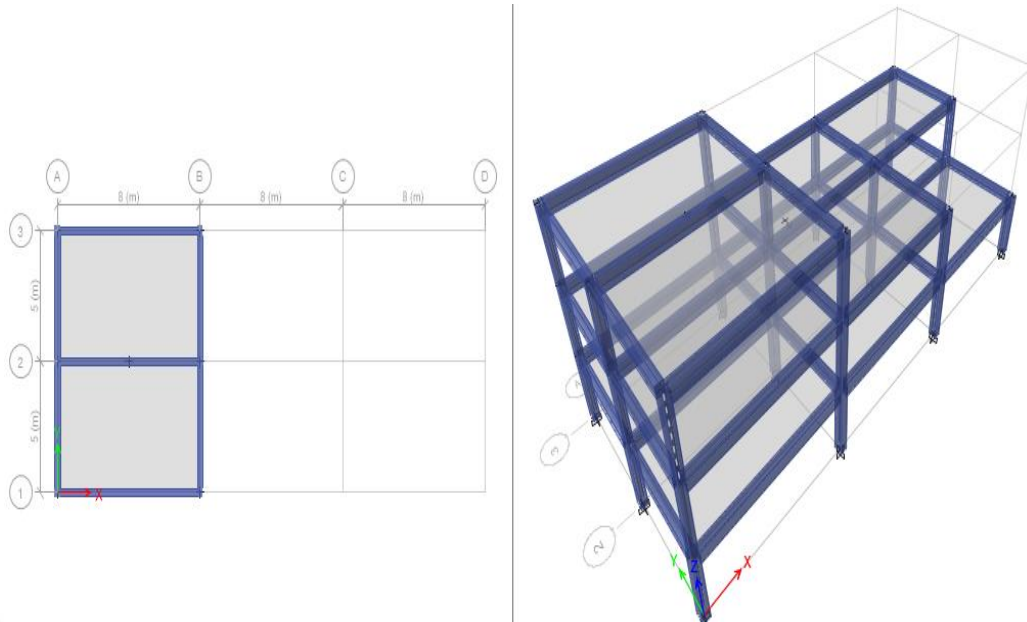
Third story plan and 3D of 3 story irregular rcc building
